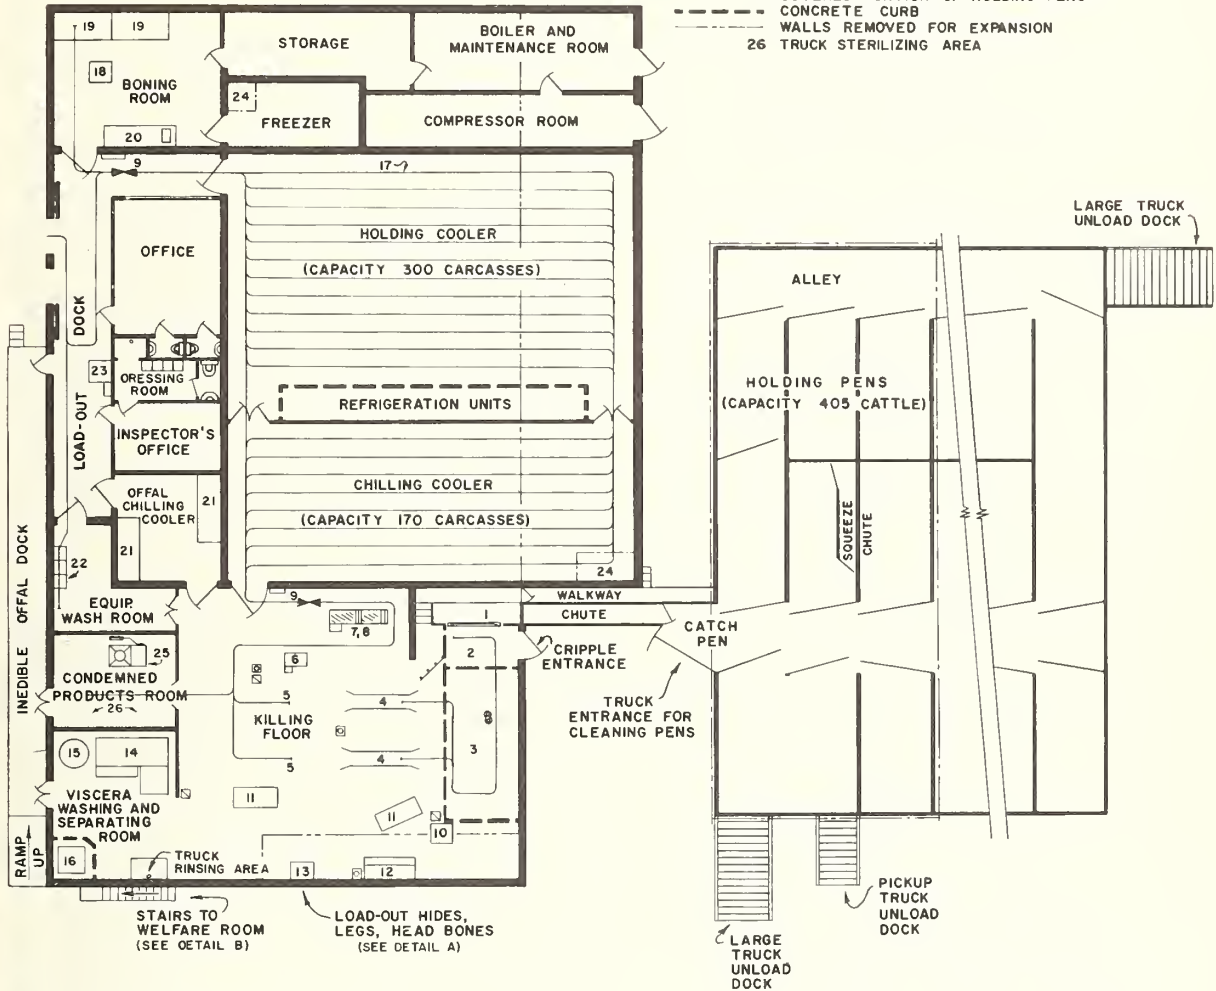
Layout of a proposed plant slaughtering 100 cattle daily.
